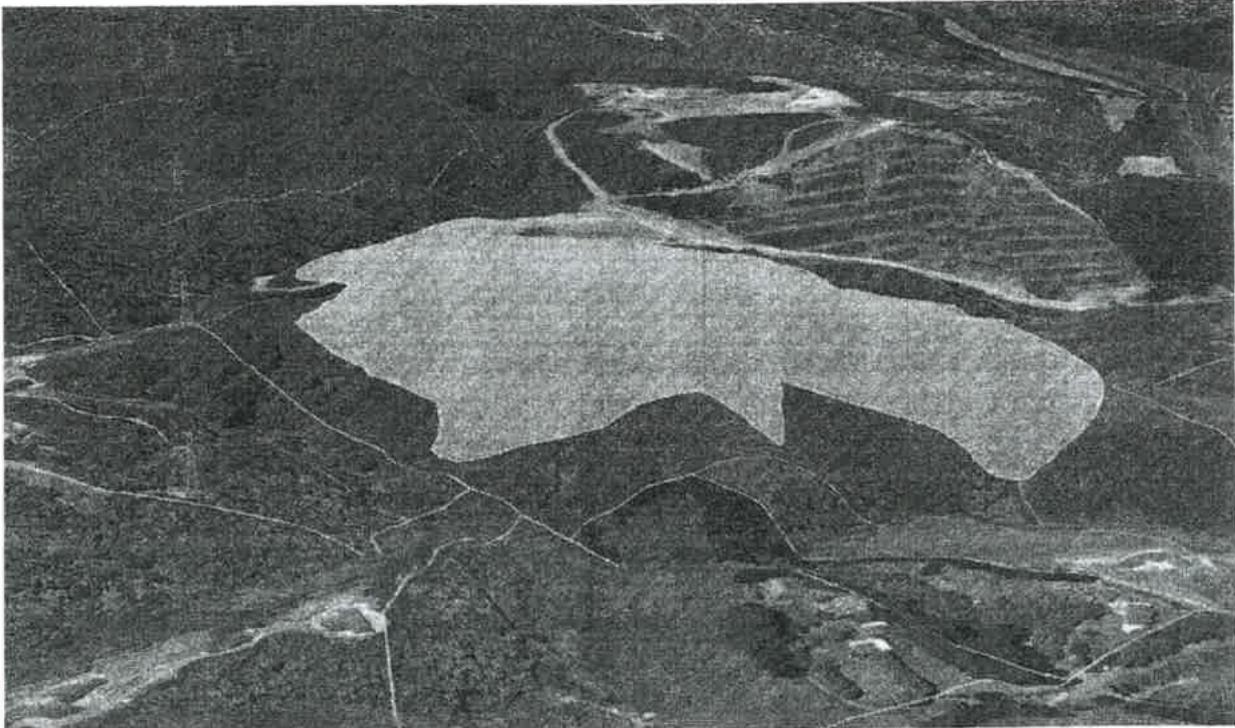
Aerial View of Stage 3 of Proposed OBDA (Looking East Towards Existing Quarry)
